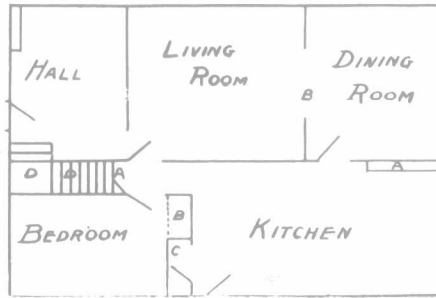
Either this plan or the one above may be used with upstairs shown in fig. 3. If a large kitchen is preferred, use this plan, and place built-in cupboard near dining-room door.
